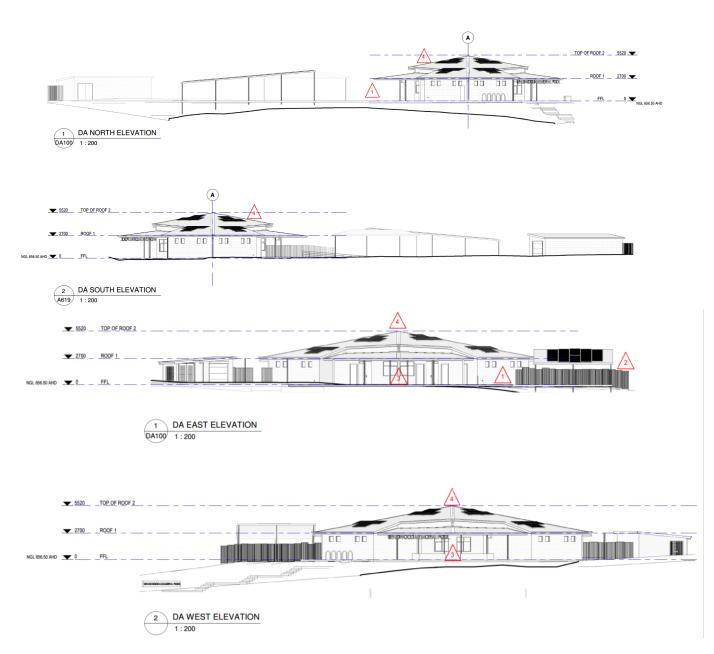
Compare to Figure 5 above – Modifications showing amended roof
